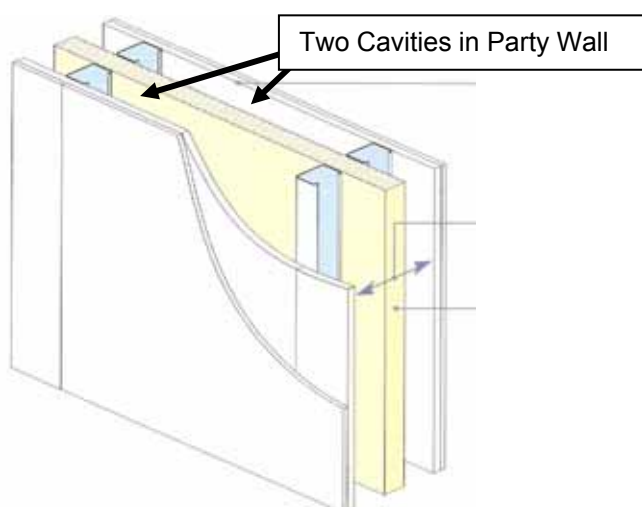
Robust Detail E-WS-1 Steel Frame Separating Wall (Robust Details Ltd 2005)
